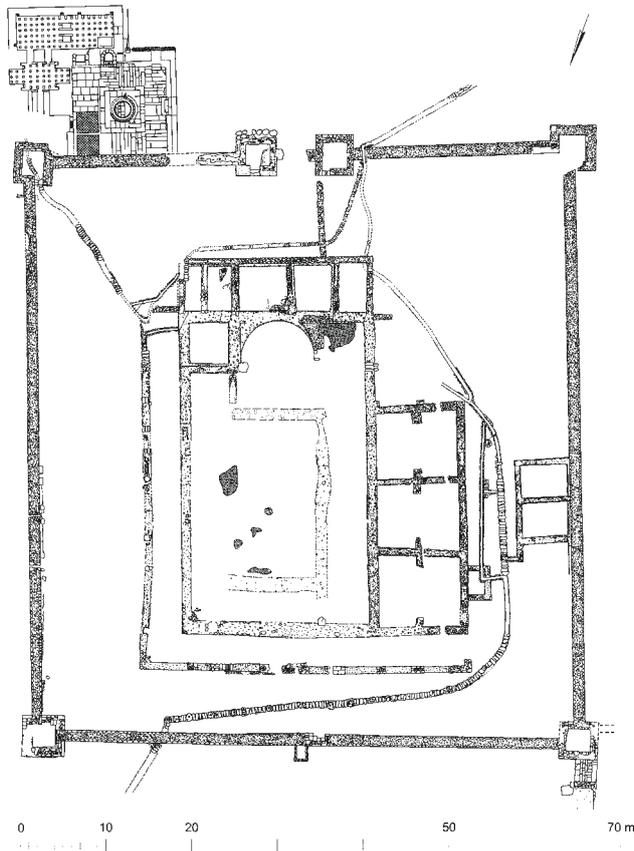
al-Šinnabra (Khirbat al-Karak), building within enclosure, plan of foundations and remains of walls. – (After Da'adli, Šinnabra 136 »Plan 8.2.« Numbers removed, new scale added).
